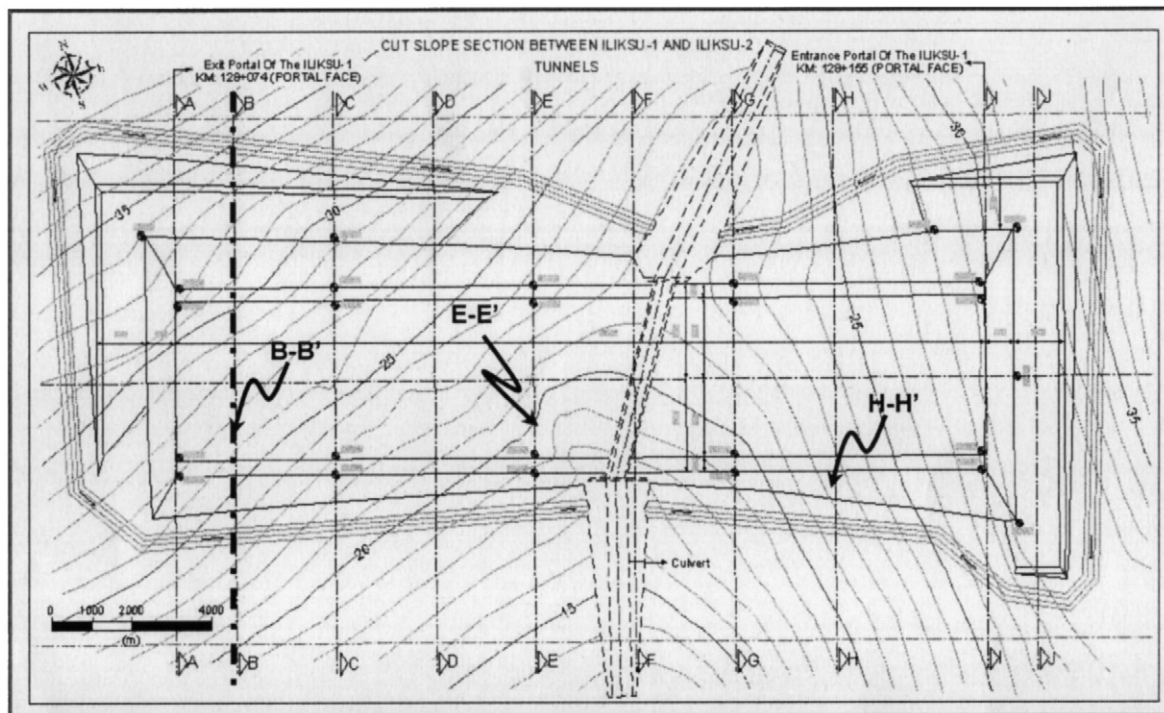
Cut slope section in between the Ilıksu 1 and Ilıksu 2 tunnels comprising pelitic schist.
